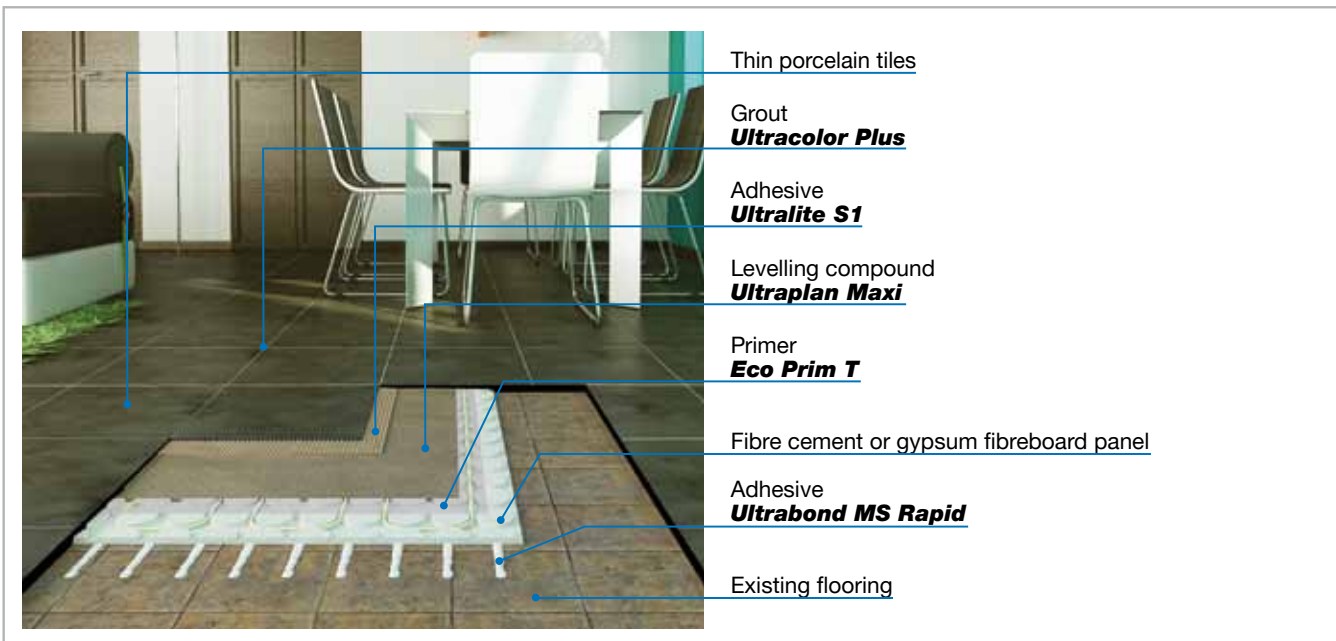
System for laying ceramic on a slim heated system with gypsum fibreboard panels
